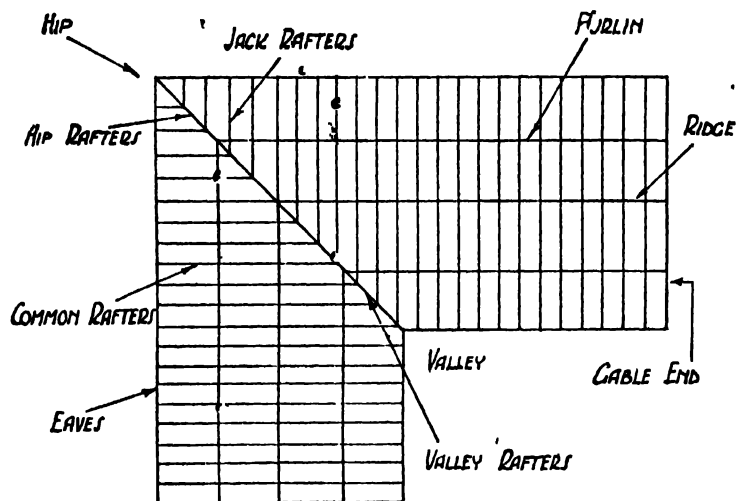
SKETCH PLAN OF PITCHED ROOF
